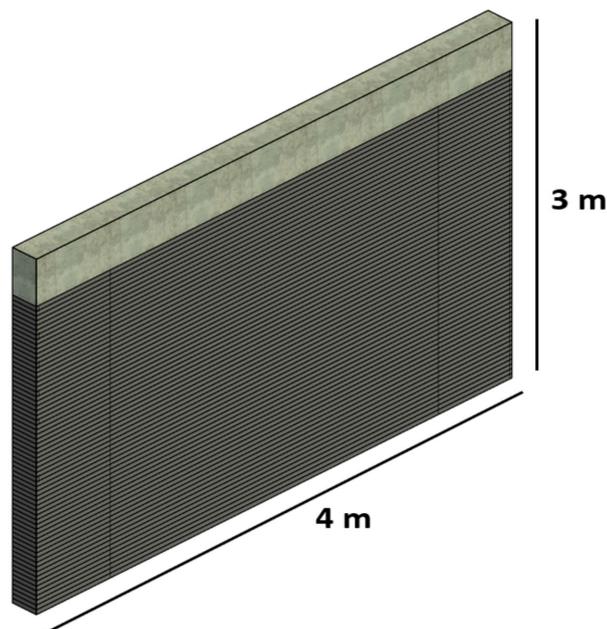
Graphic of 3DCP construction method with reinforced concrete structural system (S-2).
